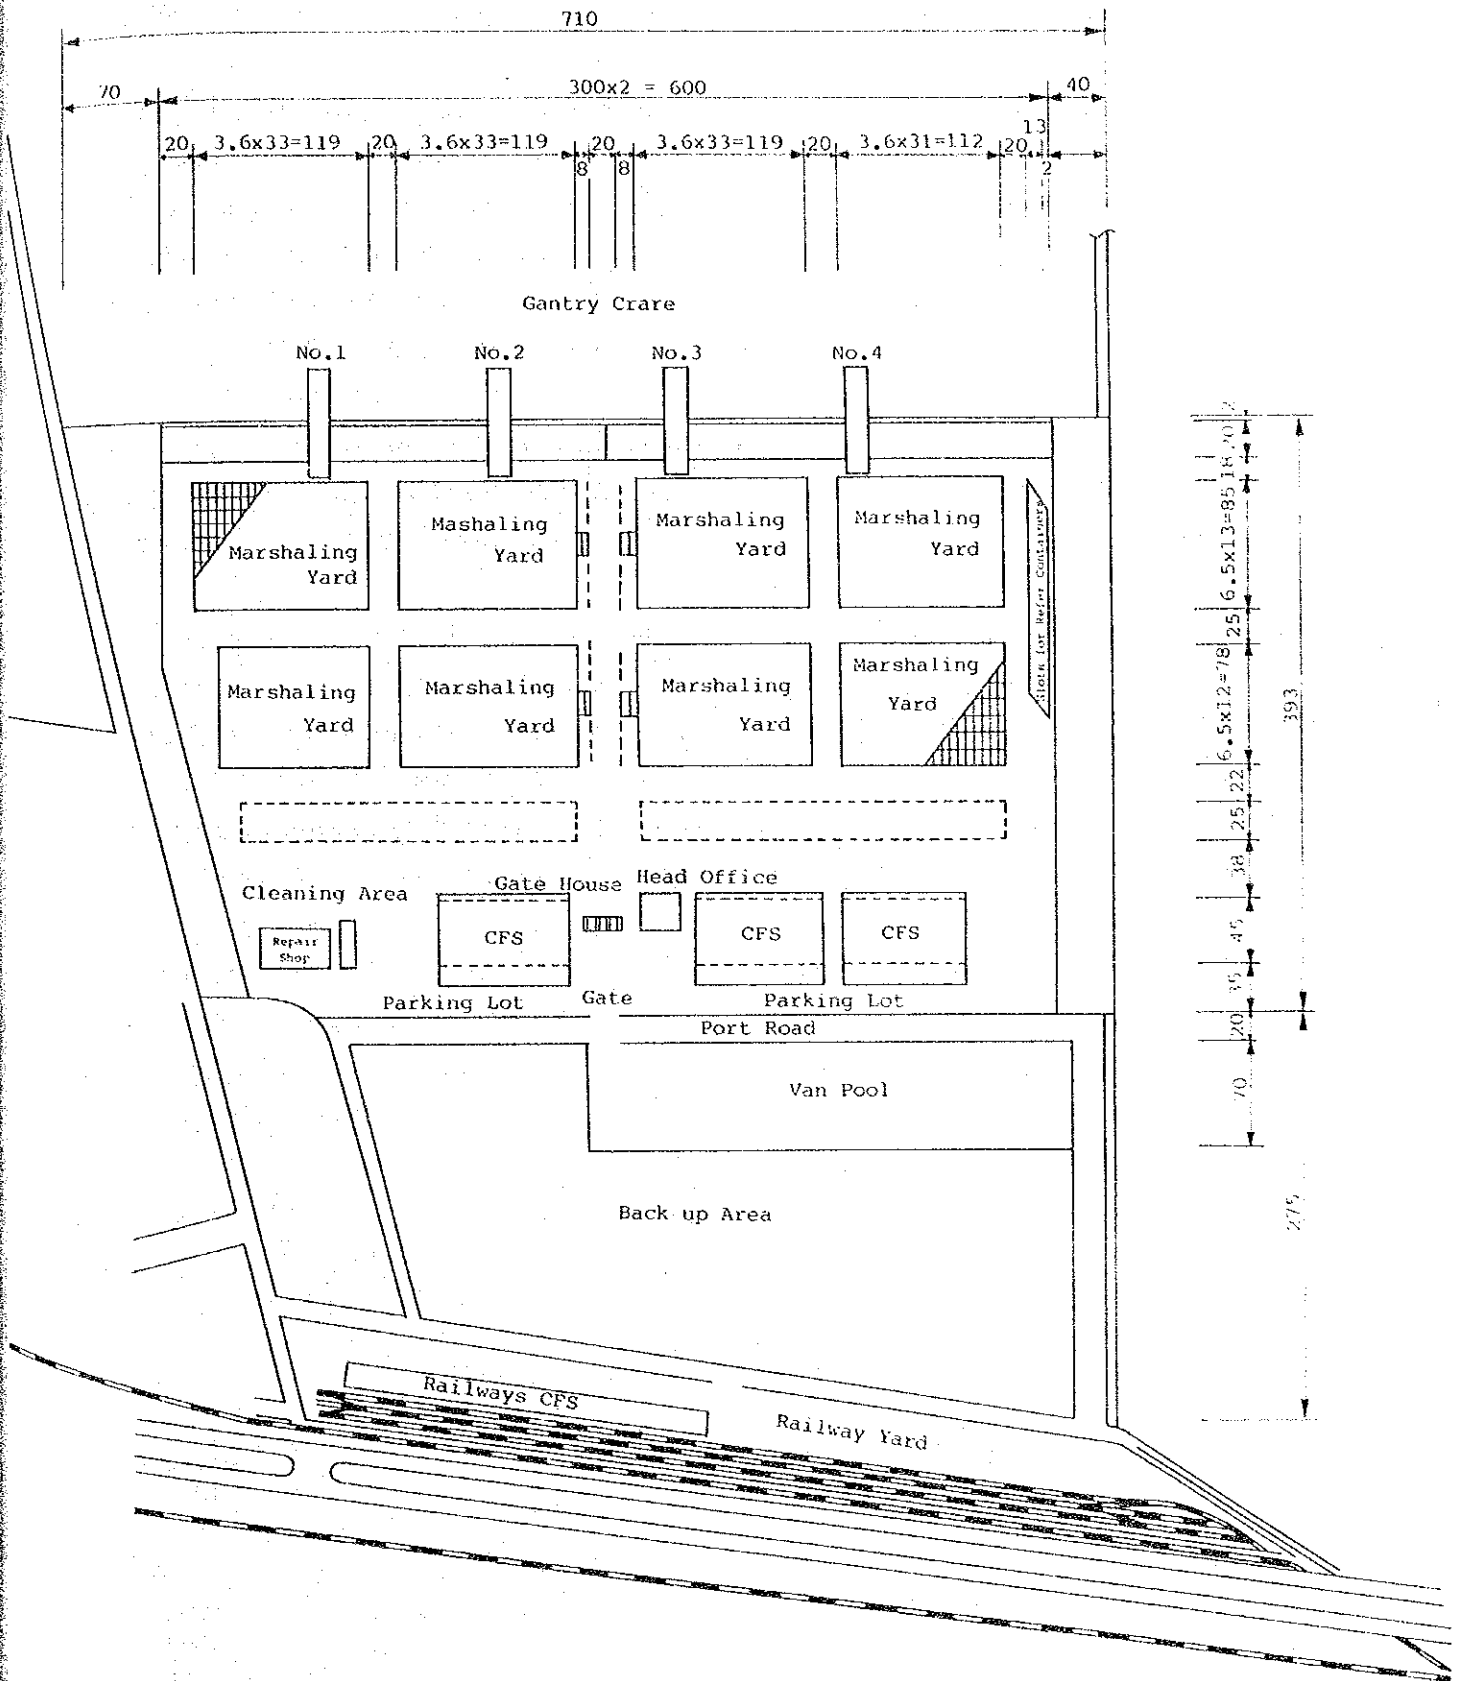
Layout Plan of the Main Facilities in Case 2-1
